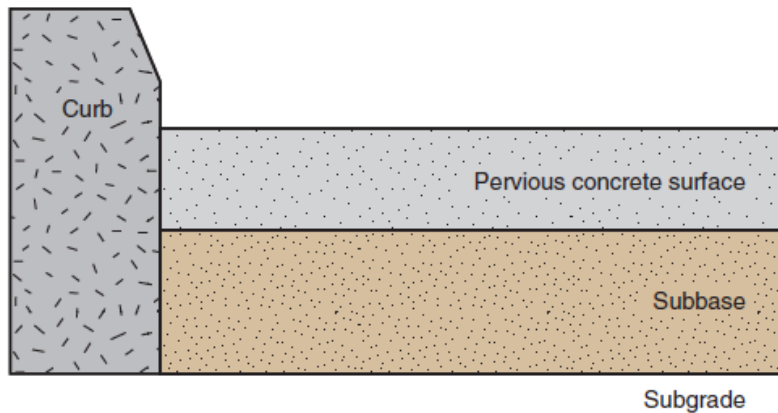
Pervious concrete pavement structure (Not to scale) (American Concrete Pavement Association, 2006, p. 1)
